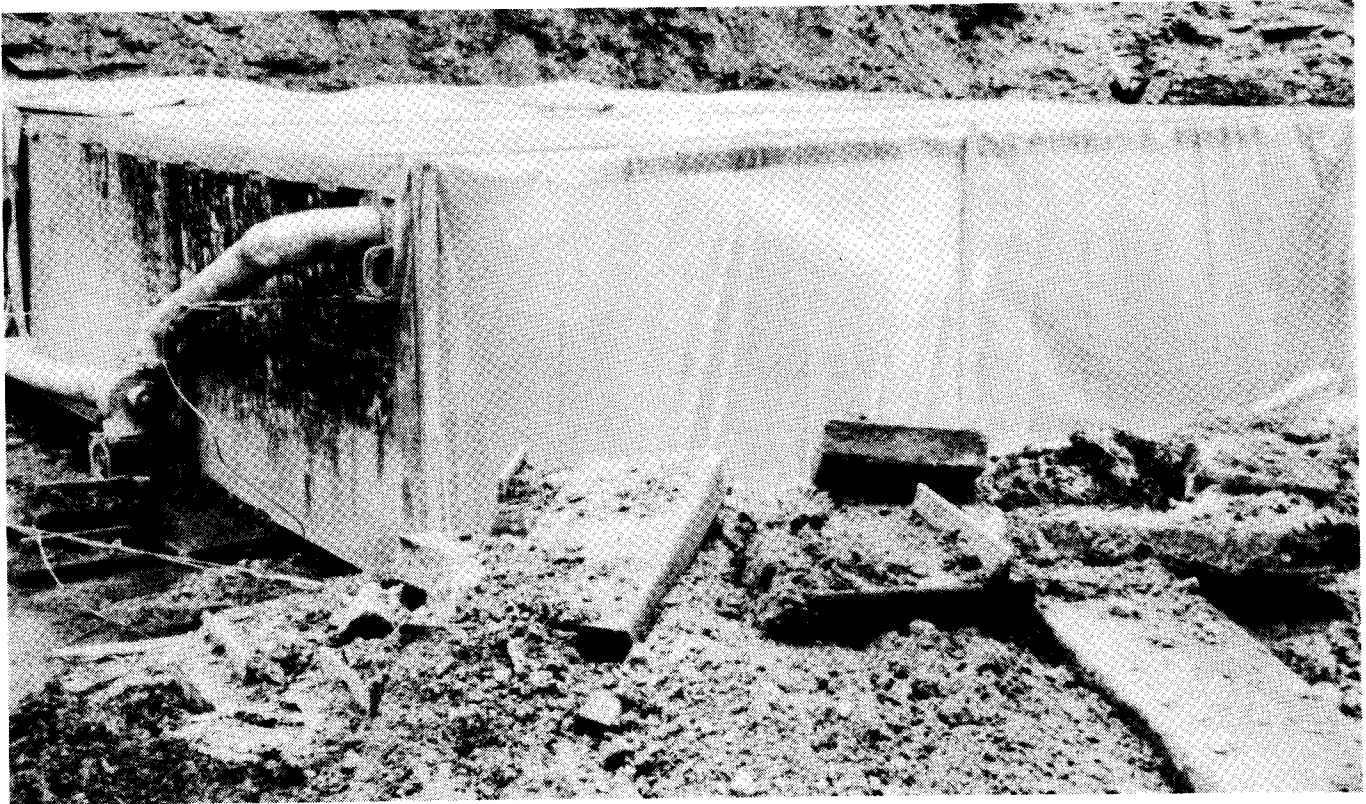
The steel and plastic incendivity test gallery in place against the highwall face.
